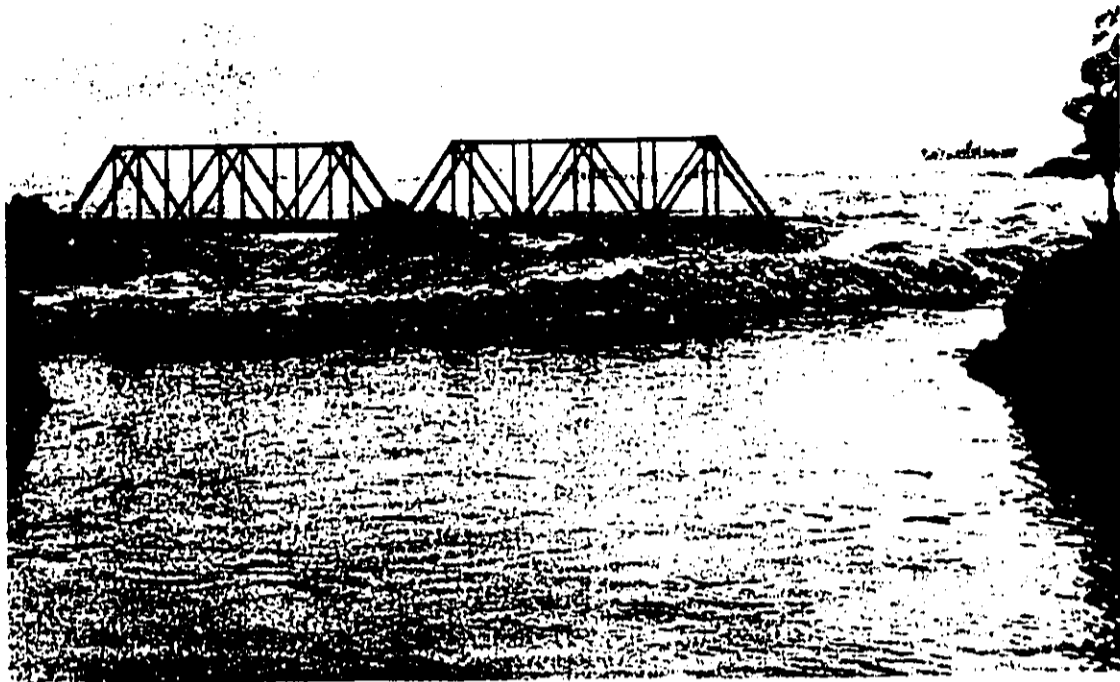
Portion of railroad bridge across Wailuku River washed away by tsunami action.
